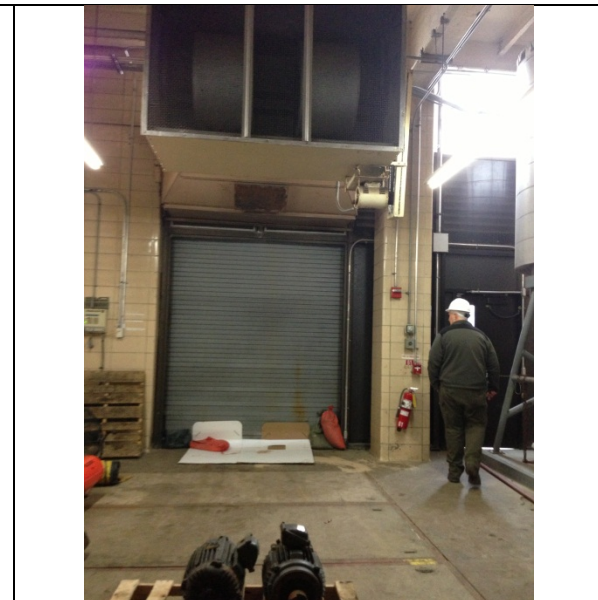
Door to emergency generator room which was successfully sandbagged.
